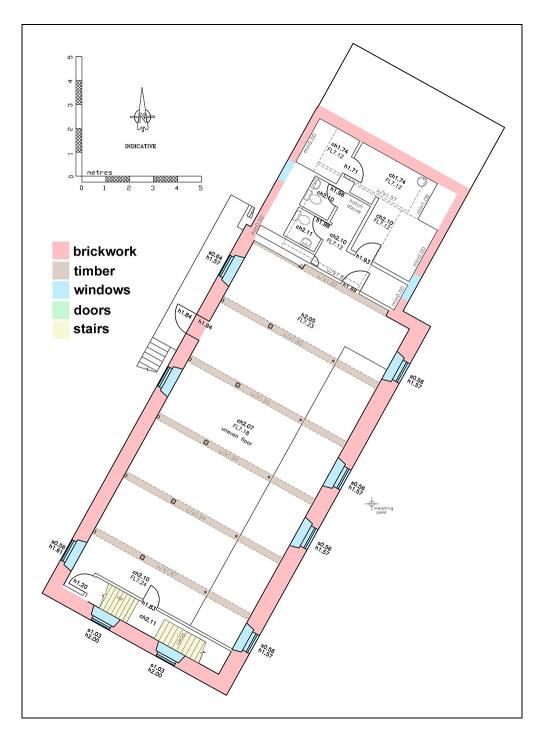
Second floor plan of Ashlett Mill showing original features (the stairs are uncertain)
